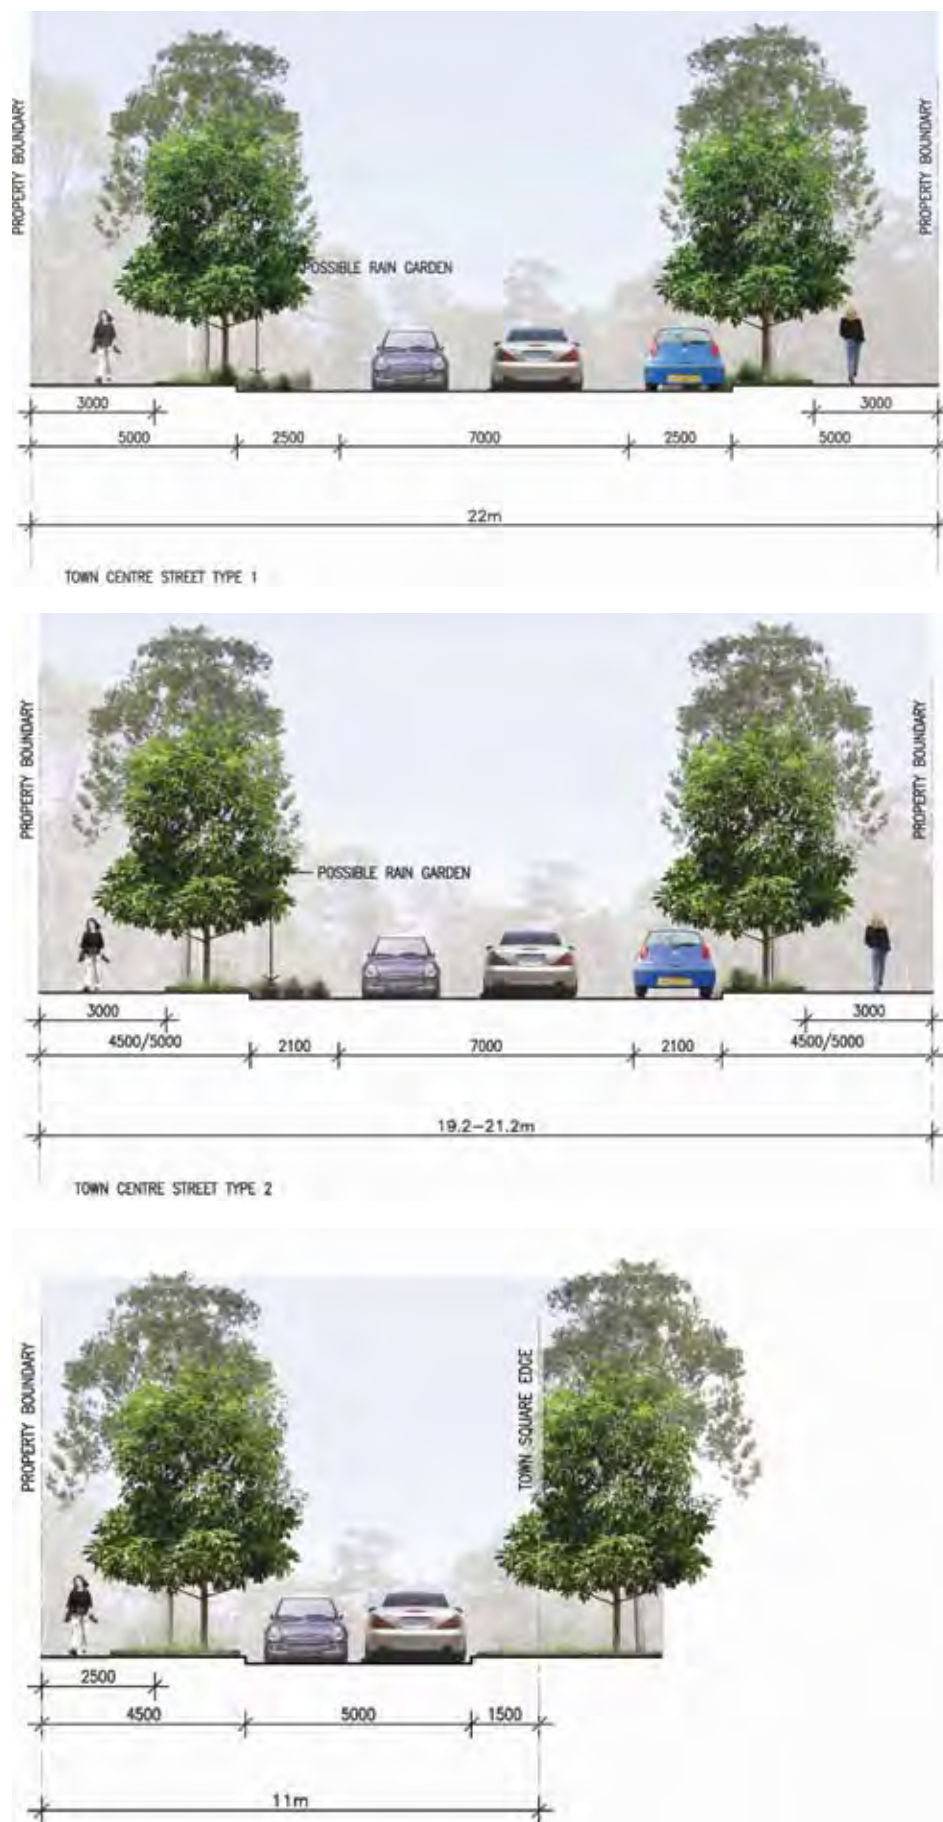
Stage 1 Town Centre - Road Carriageway and Reserve Widths
